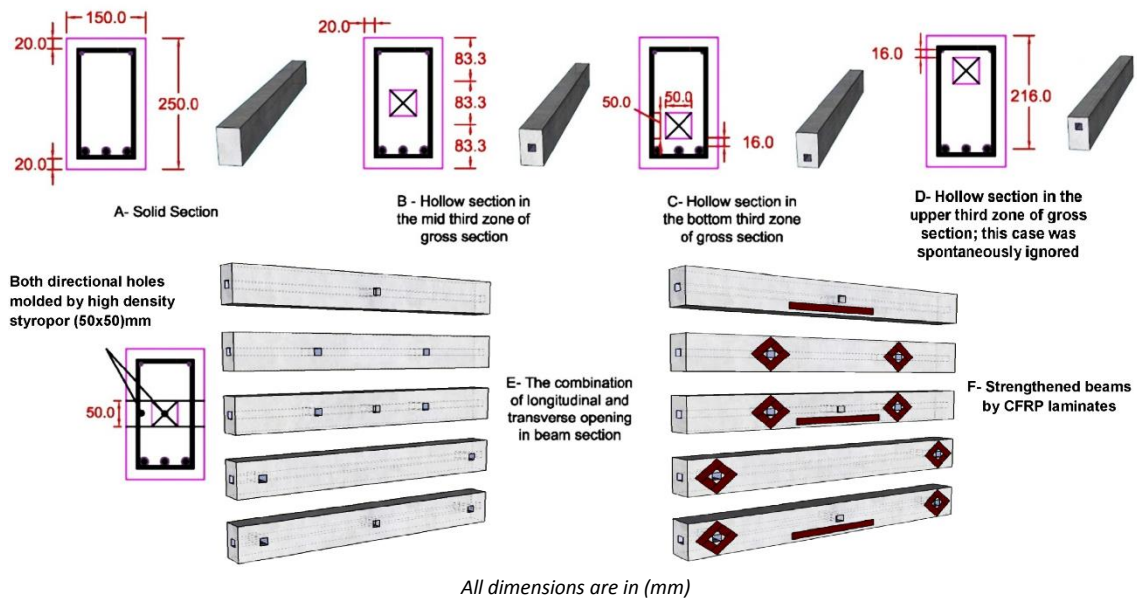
Details of Model Sections and Locations of Web Opening with Strengthening Systems
